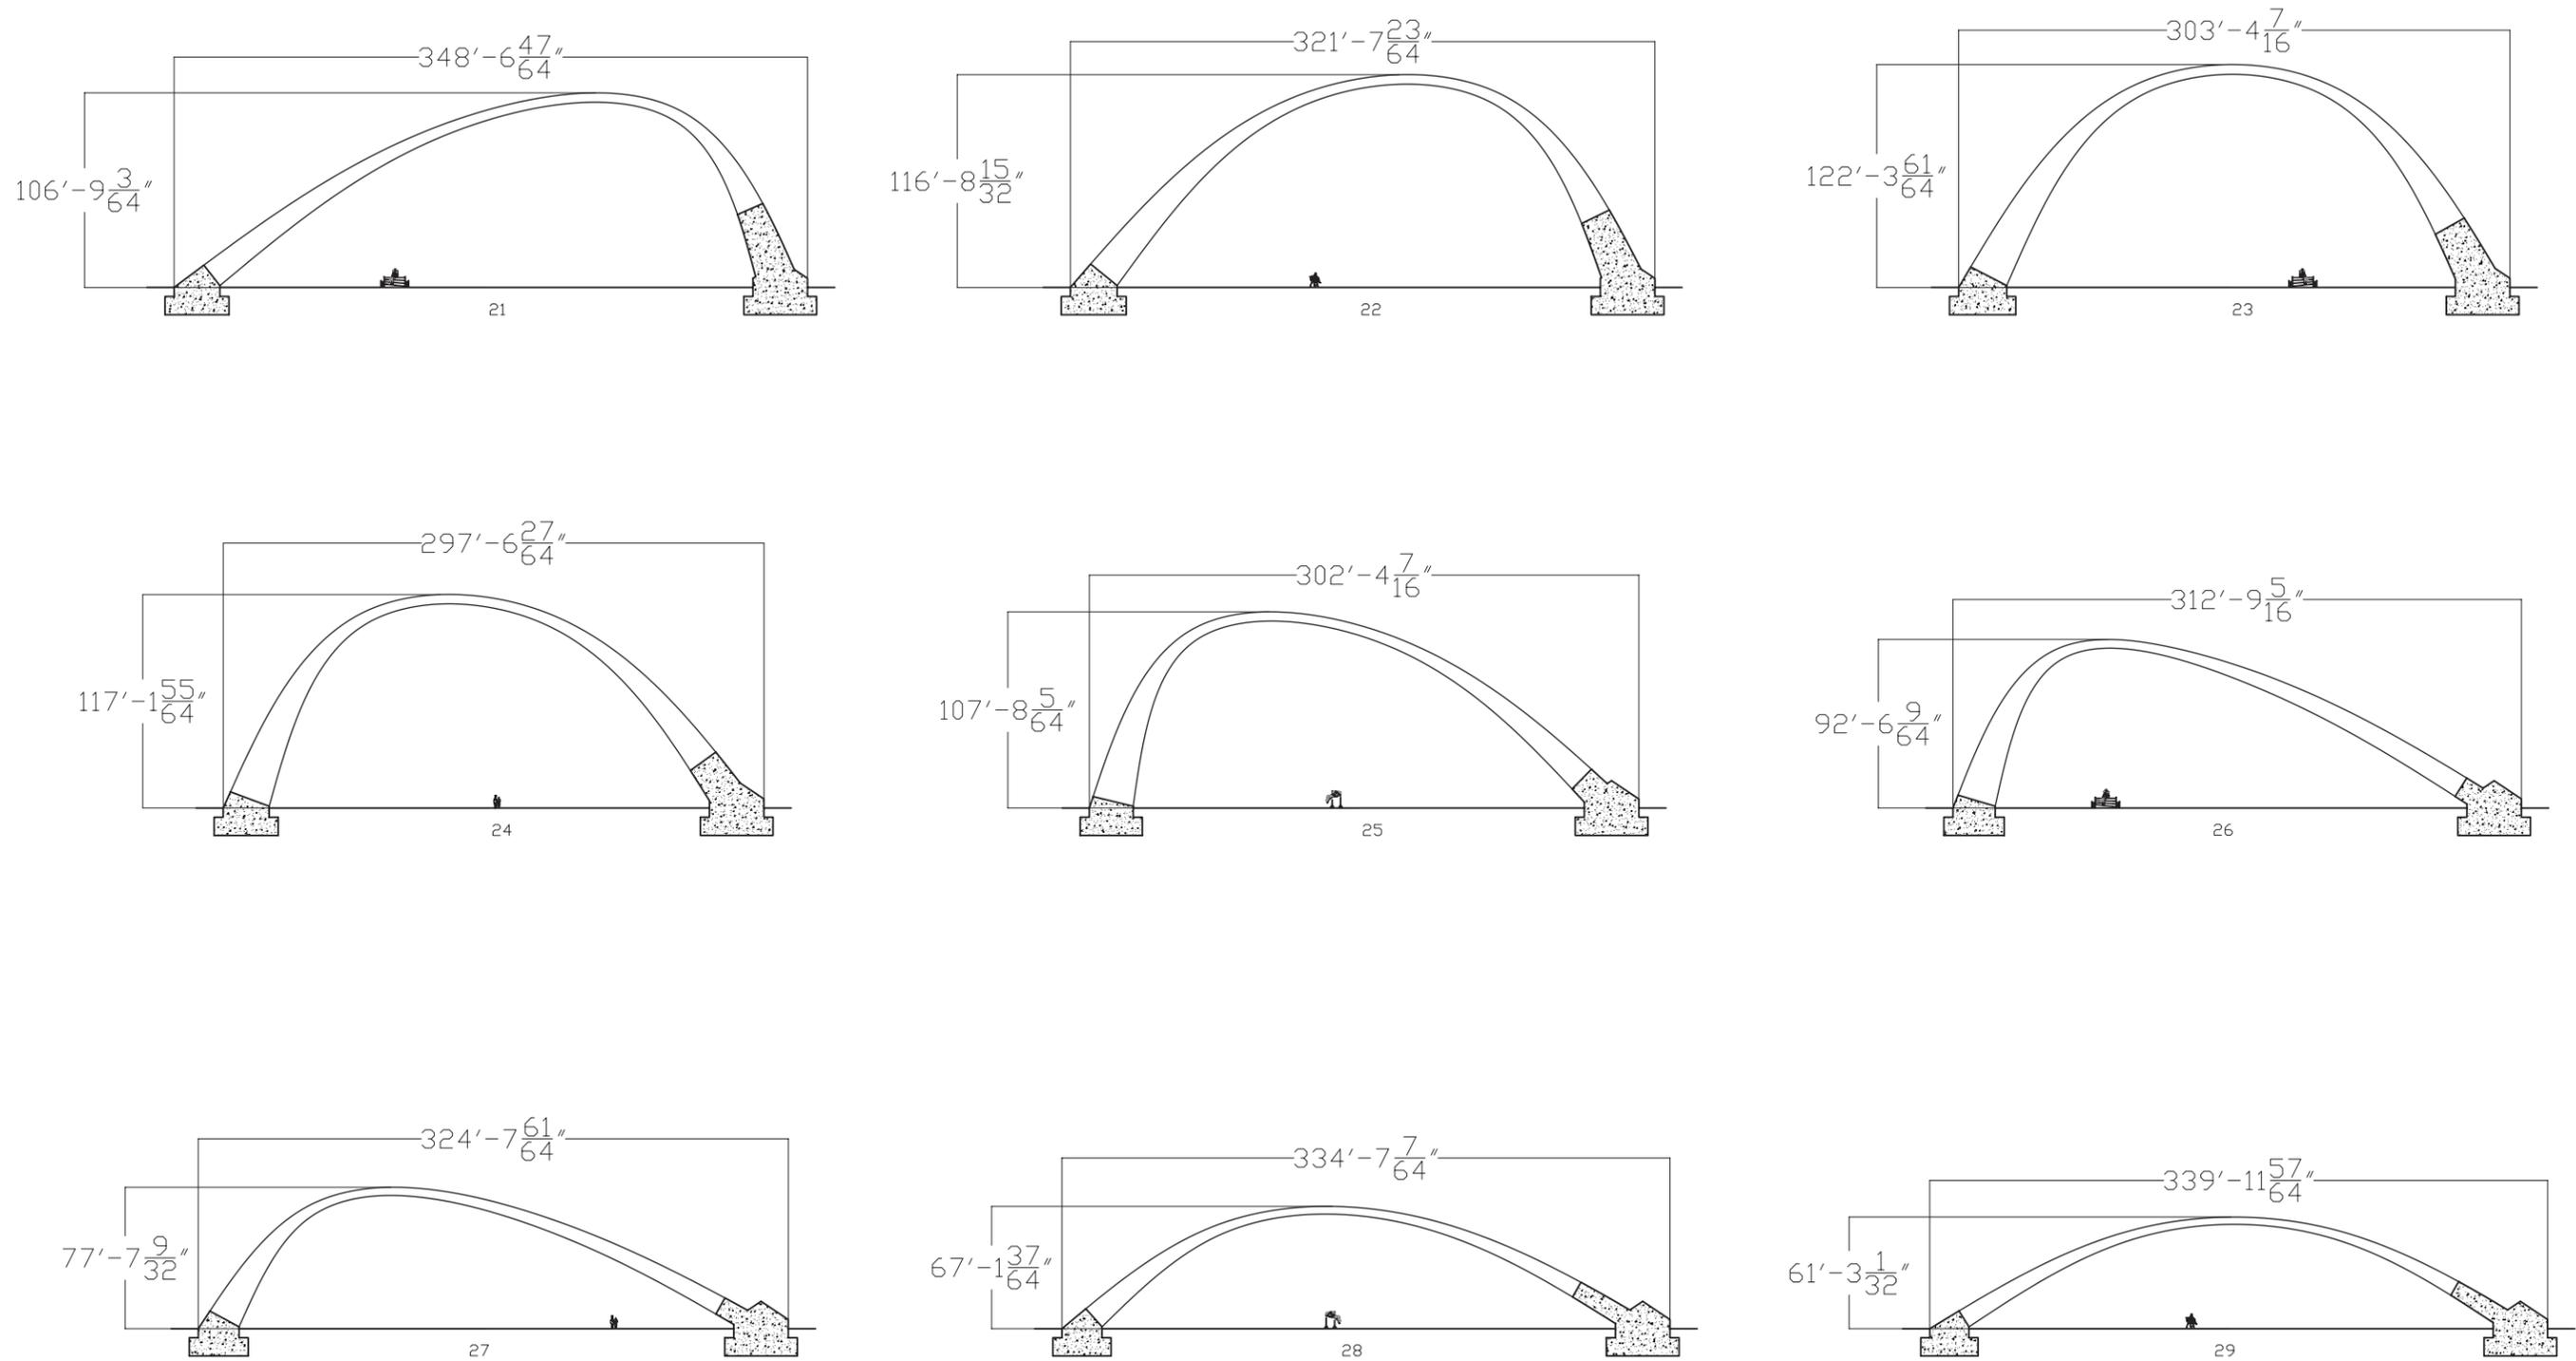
Elevations of Primary Arches (Arches 21-29)
